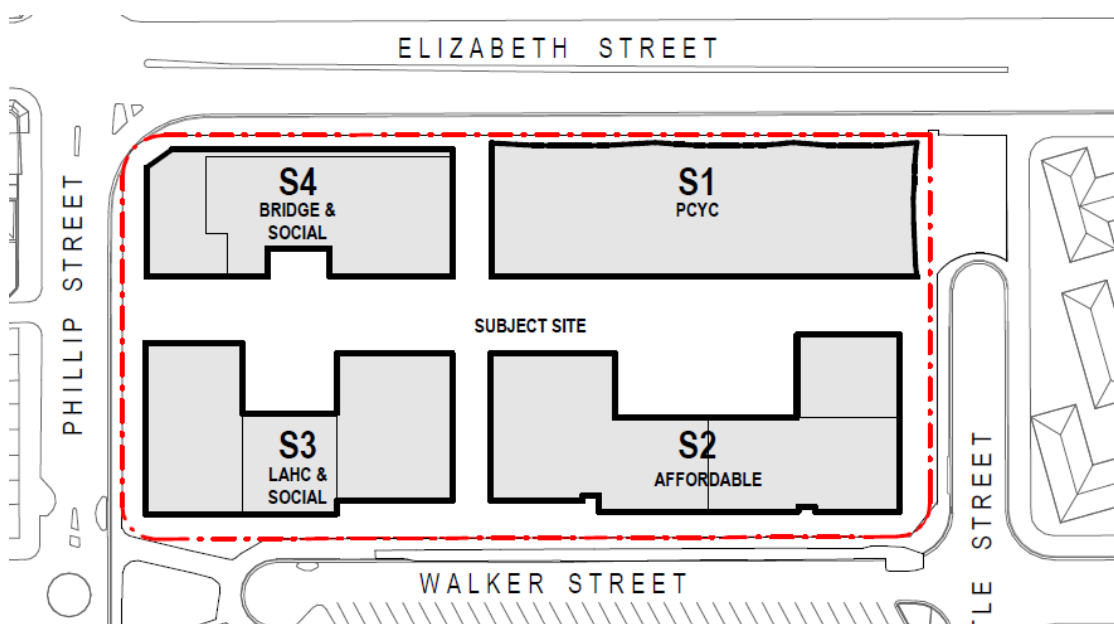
Masterplan of the site showing location of four buildings. Source: Hayball.
